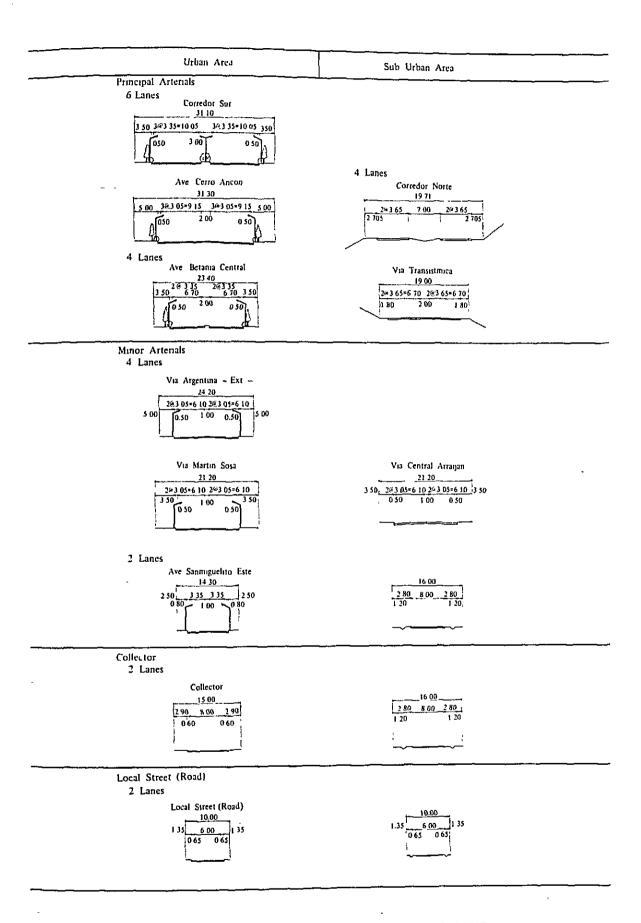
STANDARD ROAD CROSS SECTIONS
